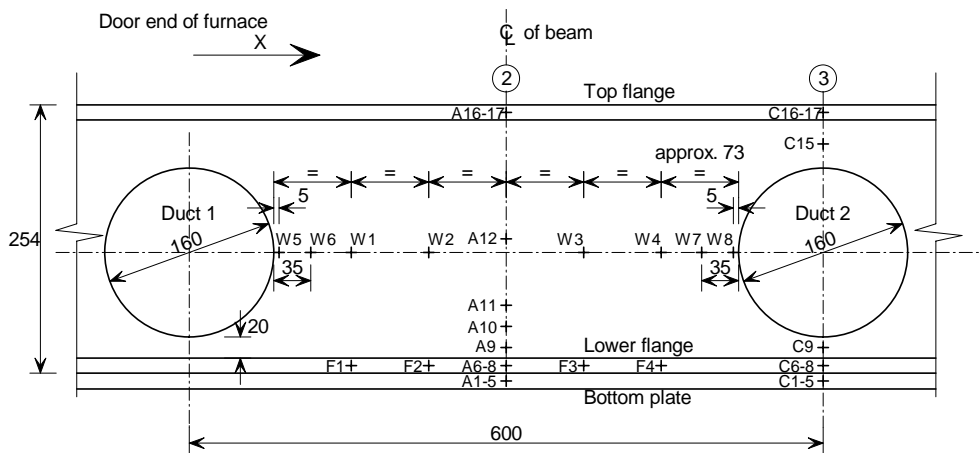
Longitudinal arrangement of thermocouple positions between web openings at mid span (Position 2).
